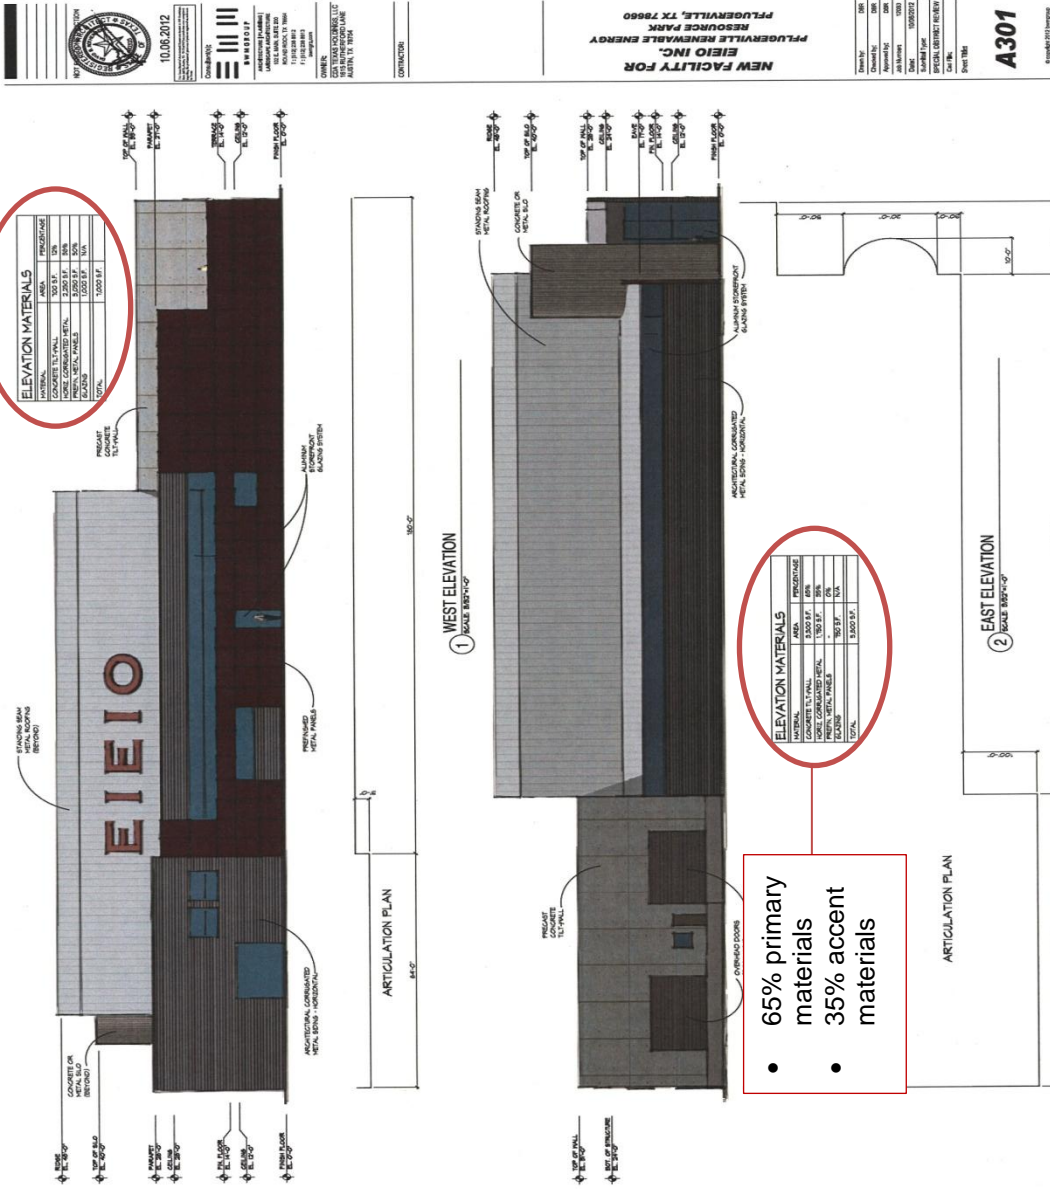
EXHIBIT B: BUILDING ELEVATIONS OPTION 1 Not for regulatory approval, permitting or construction.
